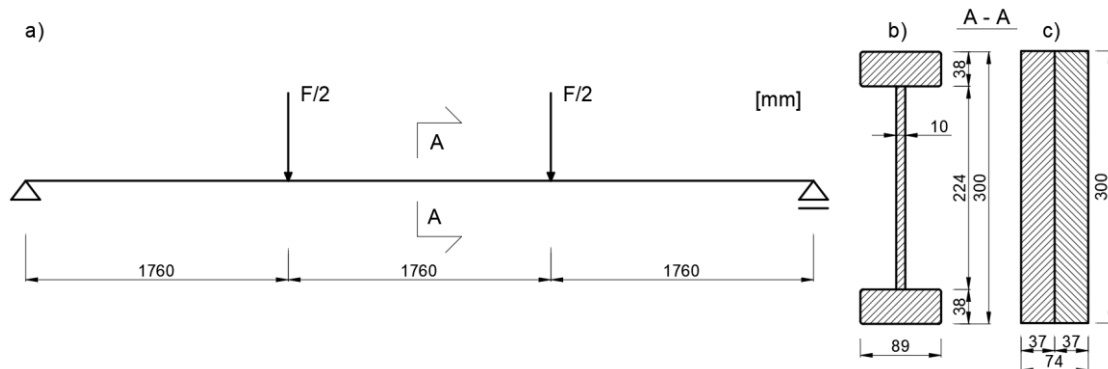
Static scheme of the tested system a) and cross-section I-beam b), OSB laminated beam c)
